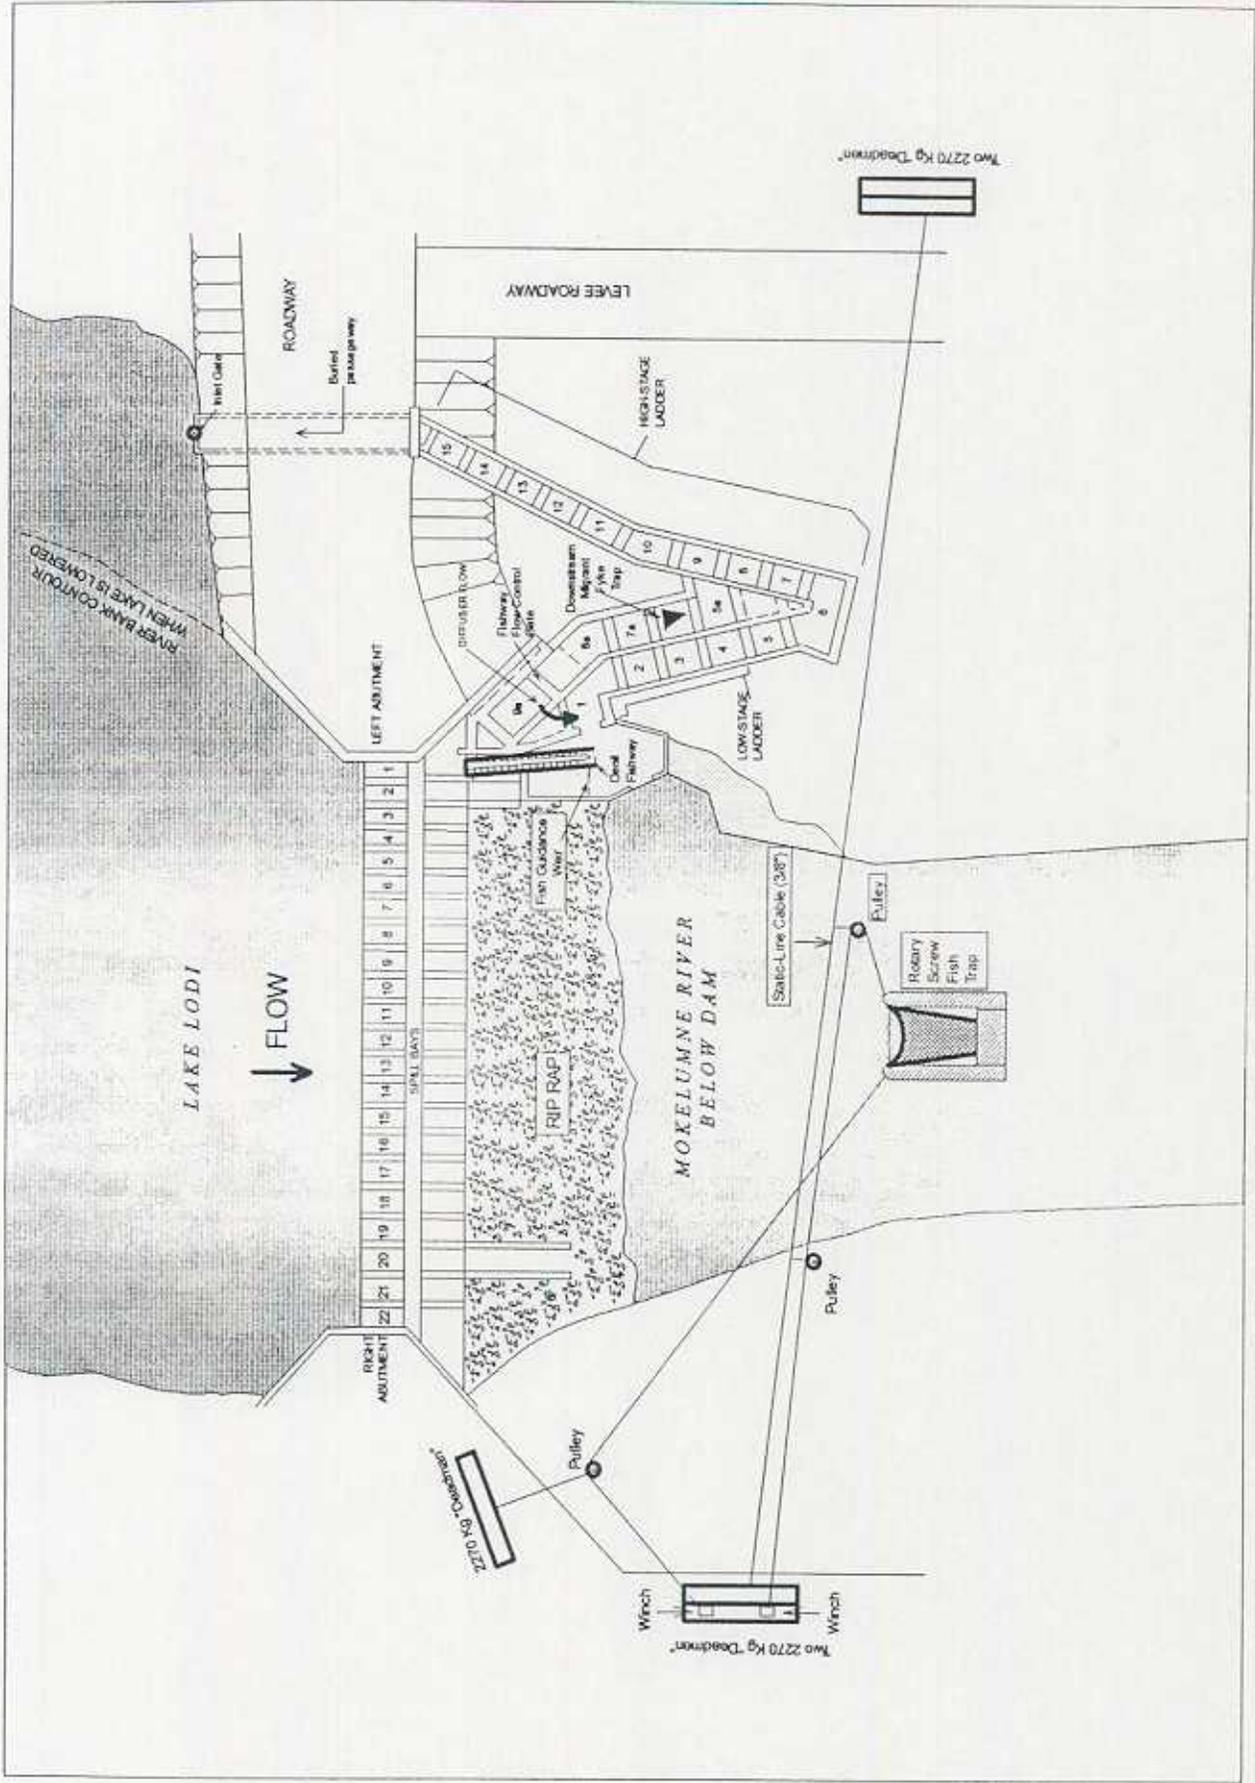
Schematic perspective view of downstream migrant fish traps used at Woodbridge Dam site (River Mile 39).
